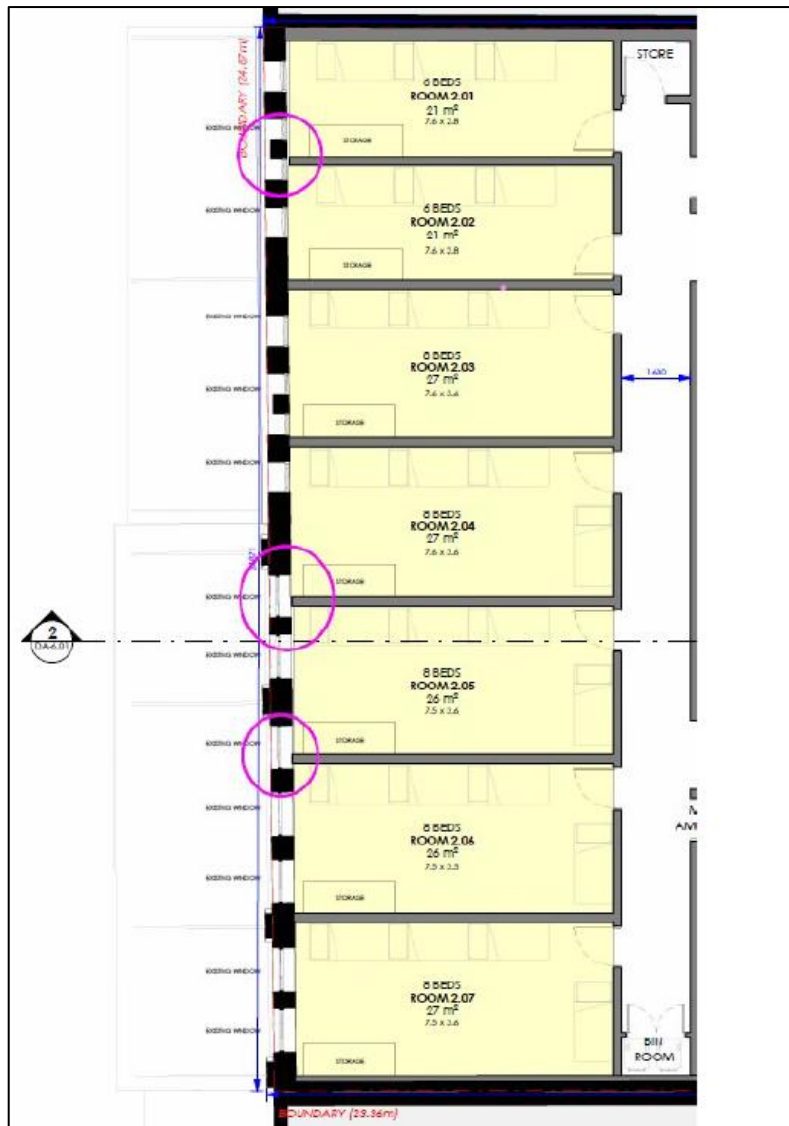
Proposed Level 2 plan showing partition walls abutting the windows of the existing facade
